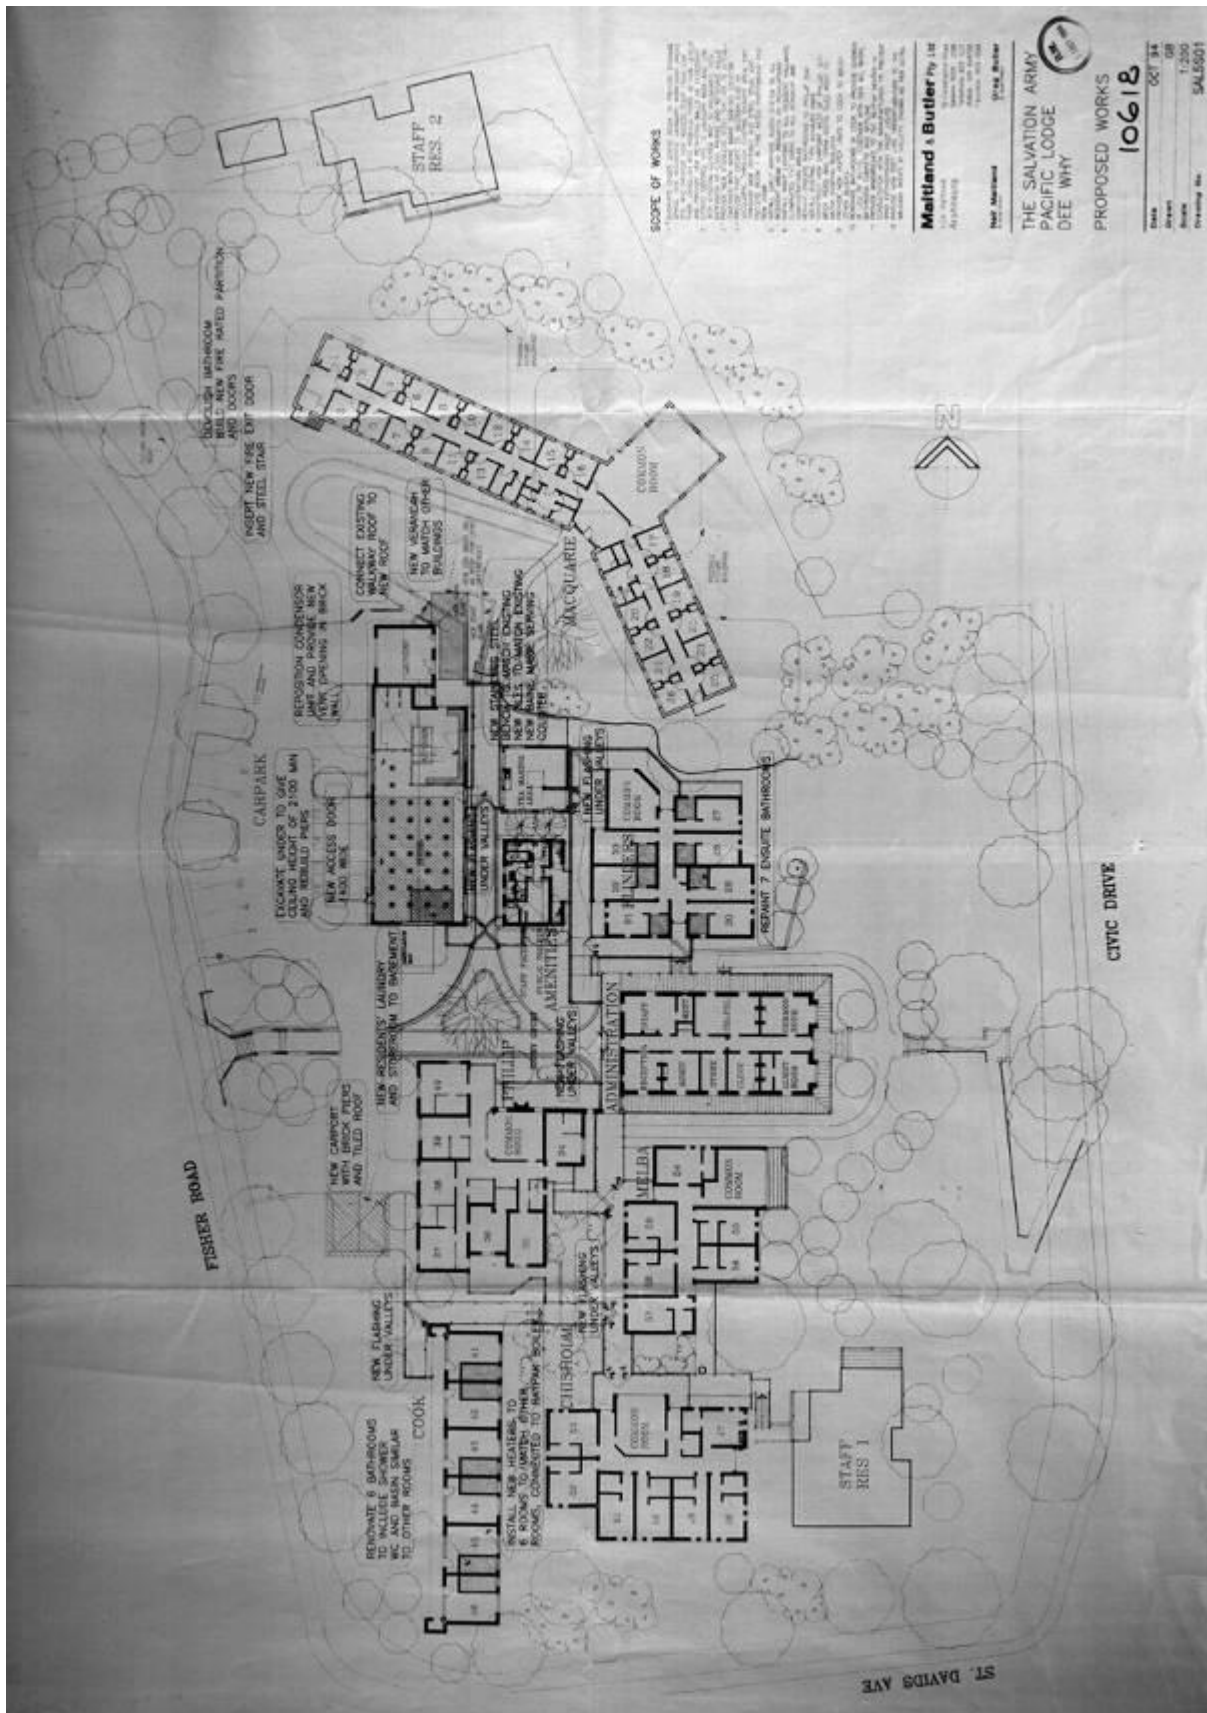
A site plan dated 1994 showing the layout of Pacific Lodge. Source: Salvation Army Drawing 941000 (Original drawing by architects Maitland and Butler).
